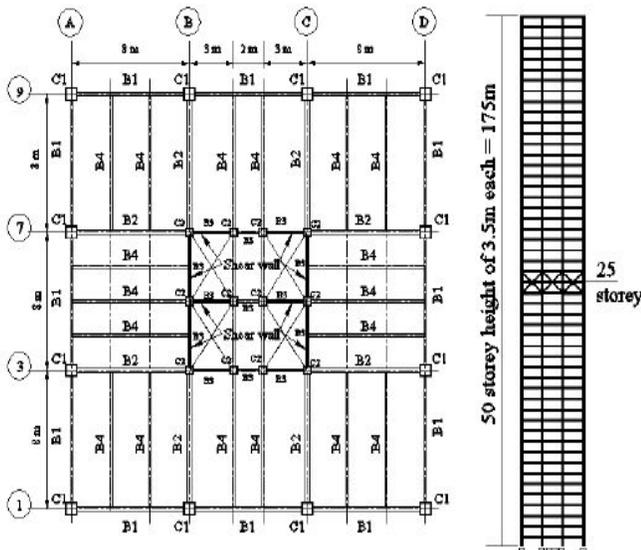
Outrigger structural system. (Typical floor plan and elevation)
